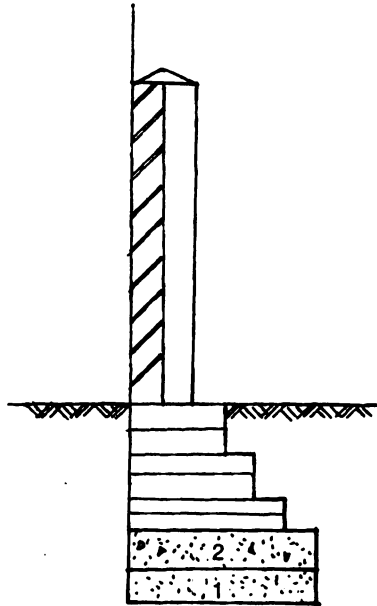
Footing foundation for compound walls in good soil: 1. Sandfill, 2. PCC.
